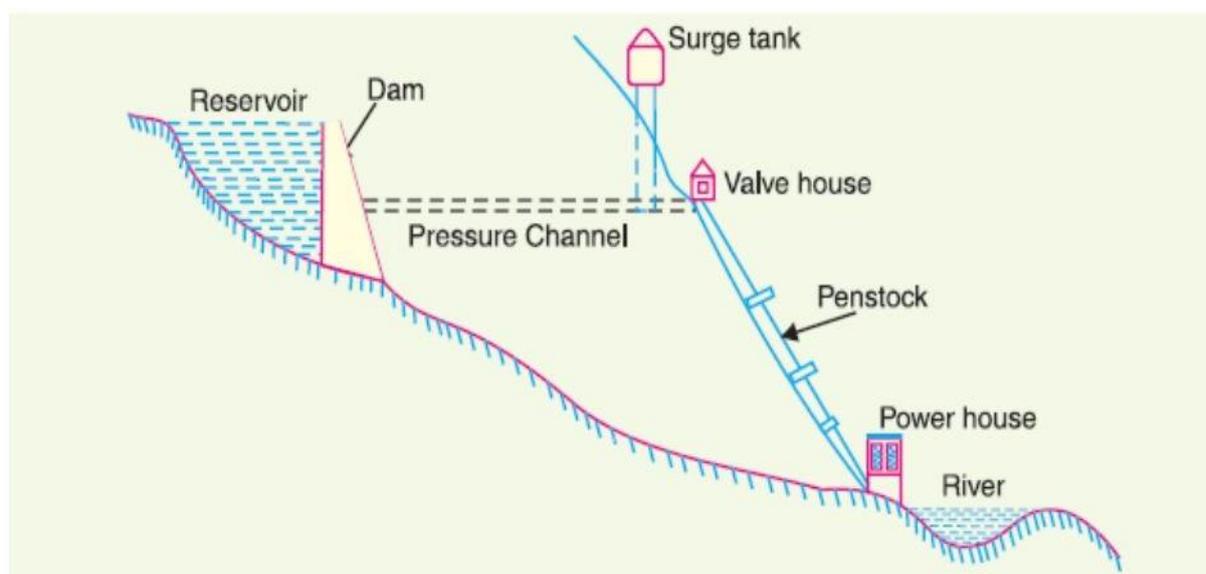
Schematic Arrangement (or) Layout of Hydro Power Plant
